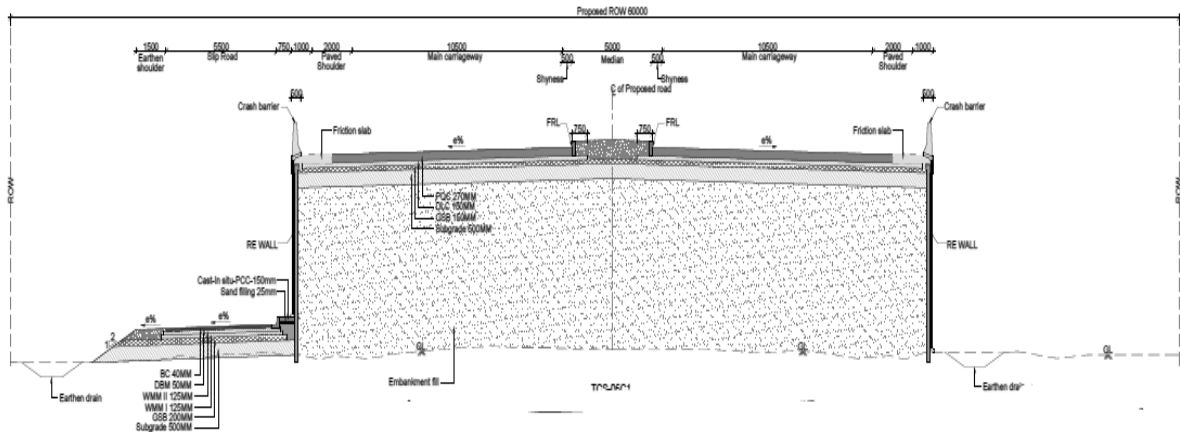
TCS-6C1 Typical Four Lane Underpass Cross Section with Slip Roads in Bypass & Realignment
